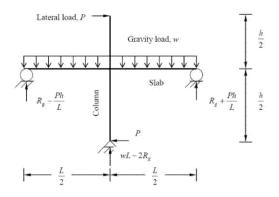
A typical Interior slab-column connection subjected to gravity and lateral loads.
